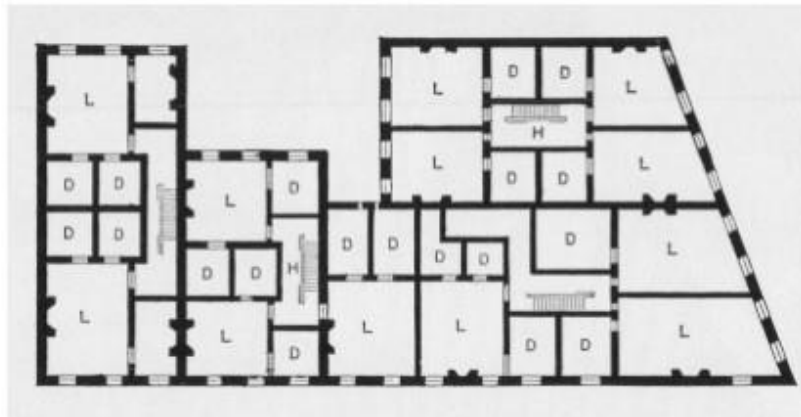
Bleeker Street tenement house plan. (Riis, 1890).
